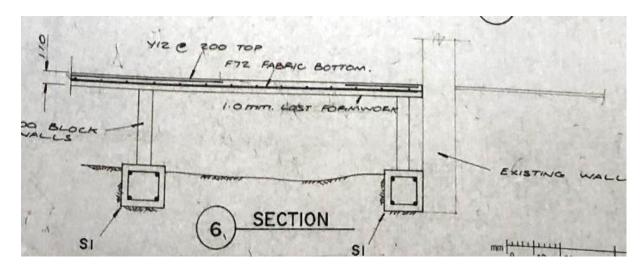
Suspended Slab in Original Building Area (Section 6 on the plan above)
